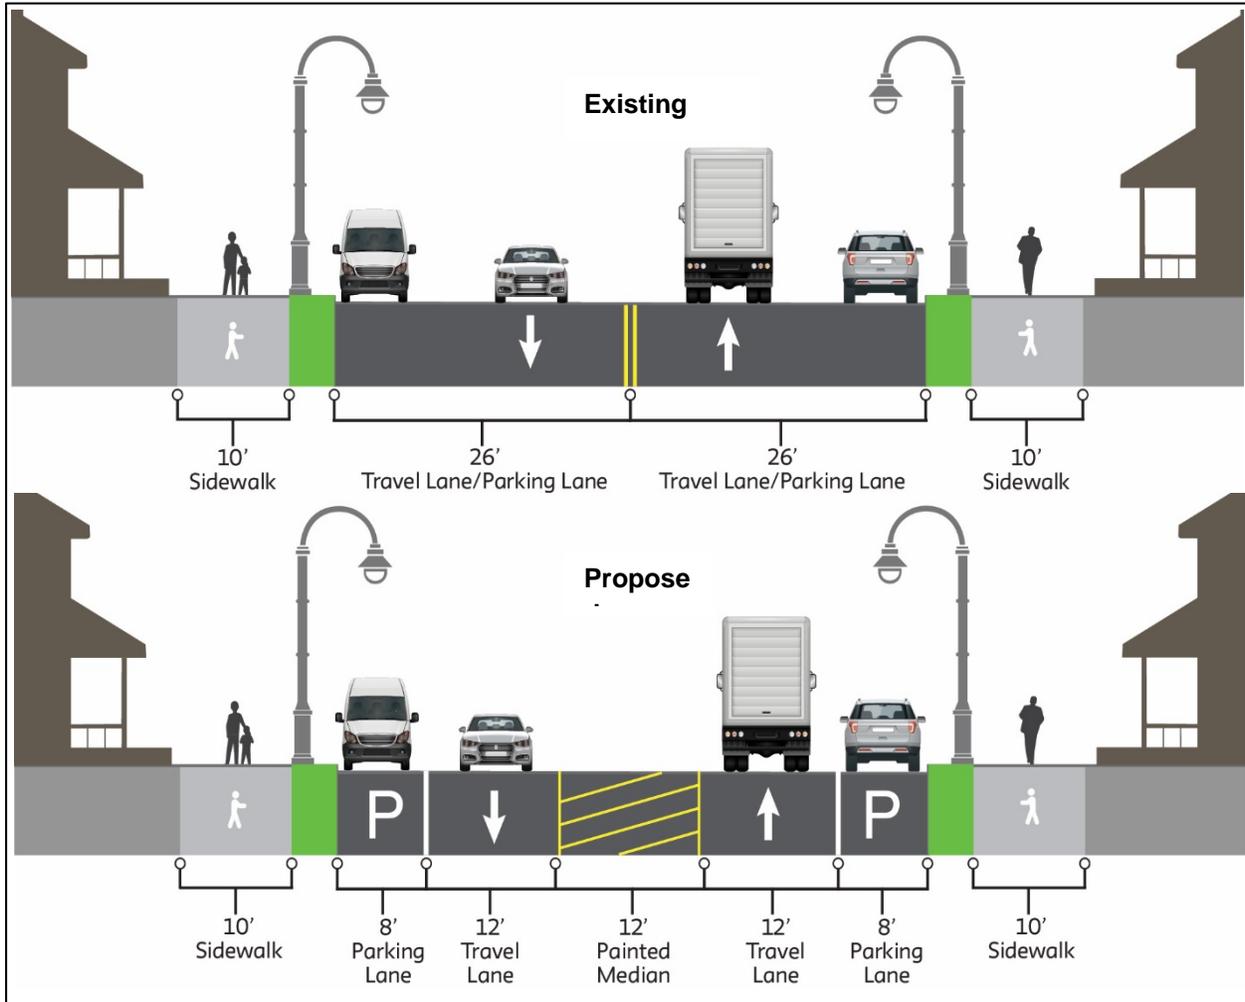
CR524 (North and South Main Street) Broad Street to Conines Millpond Bridge
